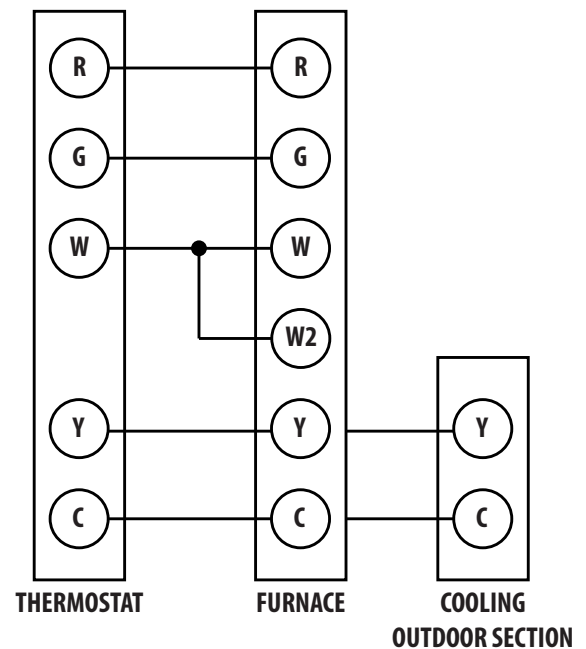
Typical Single-Stage Heat and Cool Low Voltage Connections With Single Transformer in Furnaces
